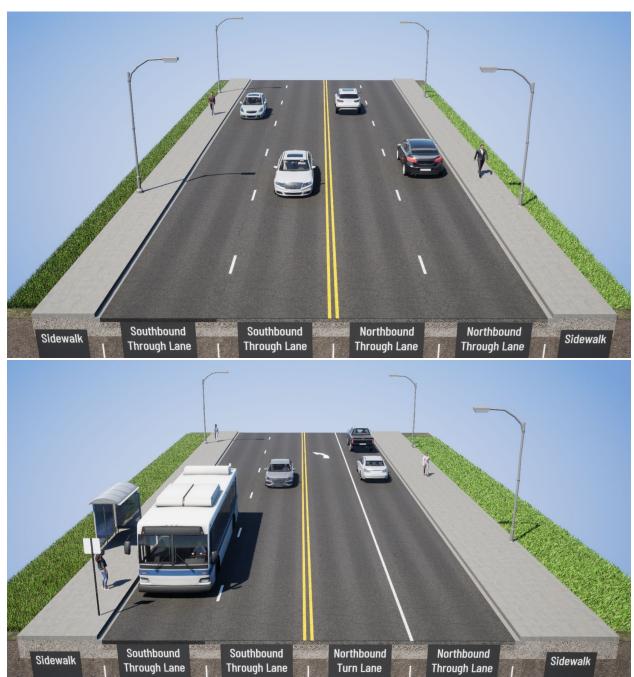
Existing Segment 2 Typical Cross Section (top) and Proposed Segment 2 Typical Cross Section (bottom)
